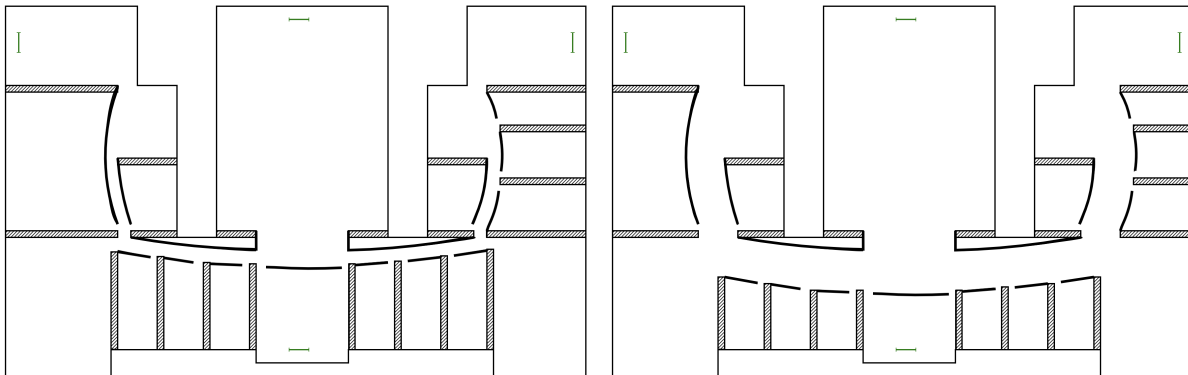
Two floor plans, both with four, three-meter wide exits, curved hallways, and obstacles. The left floor plan has a two-meter-wide hallway whereas the right floor plan has a six-meter-wide hallway.
